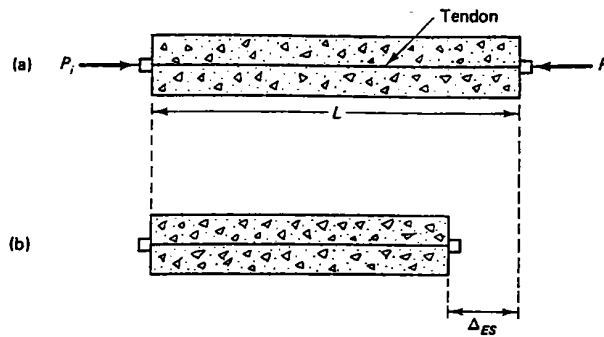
Elastic shortening. (a) Unstressed beam. (b) Longitudinally shortened beam.
